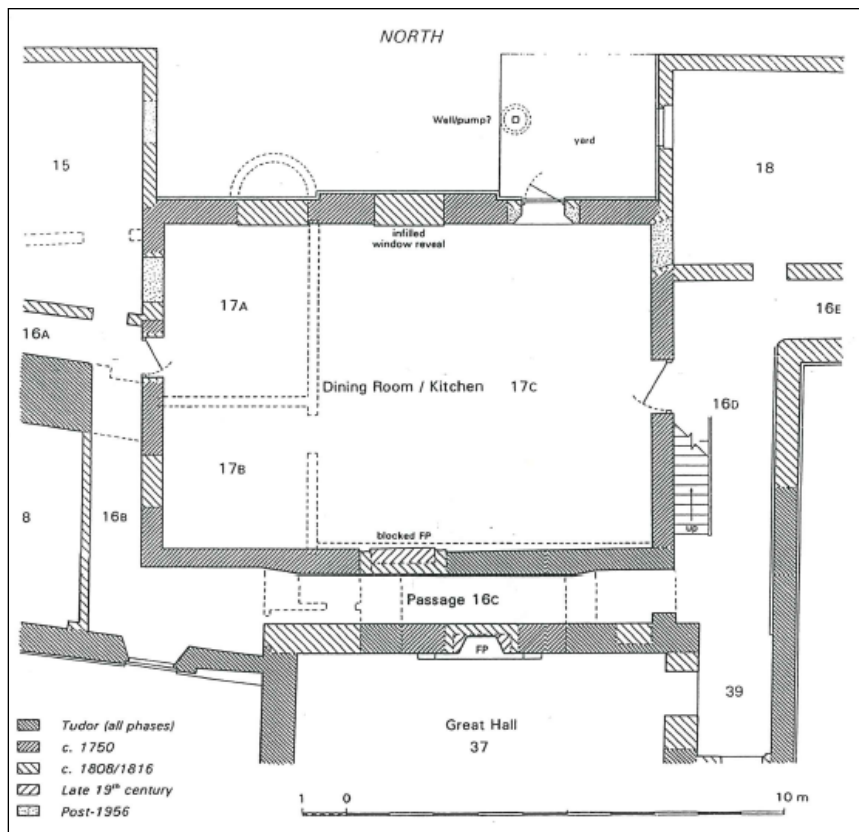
Phase plan of Bishop Sherlock's Dining Room, Ground Floor Level (after Rodwell 1996 fig. 8)
